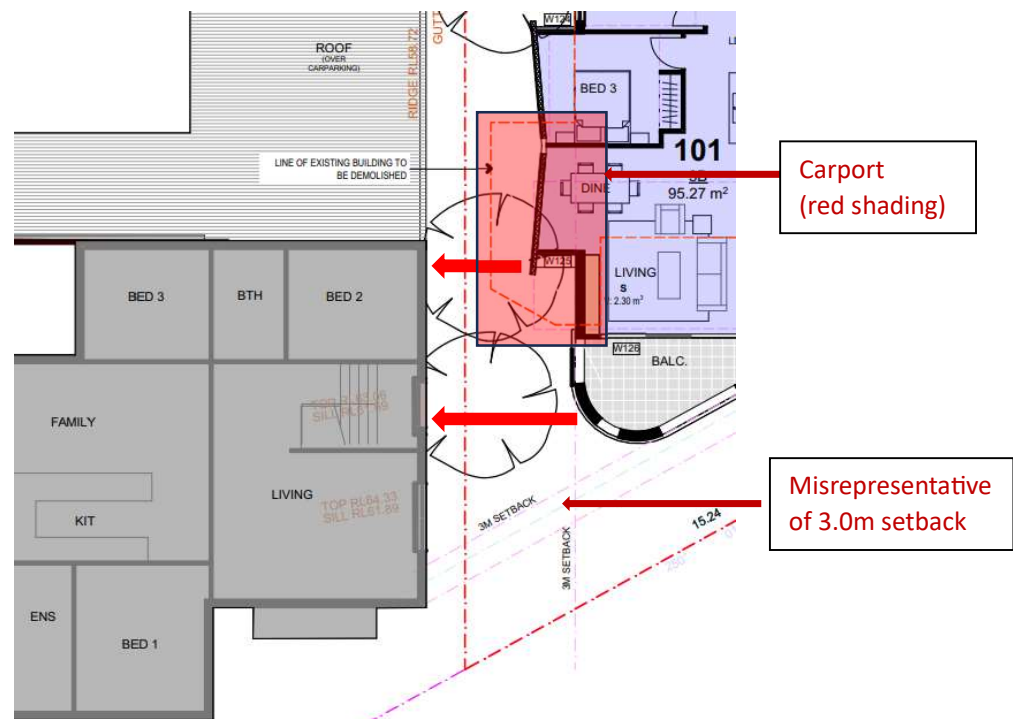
Plans - Master Set 'Level 1 Floor Plan' pg4
